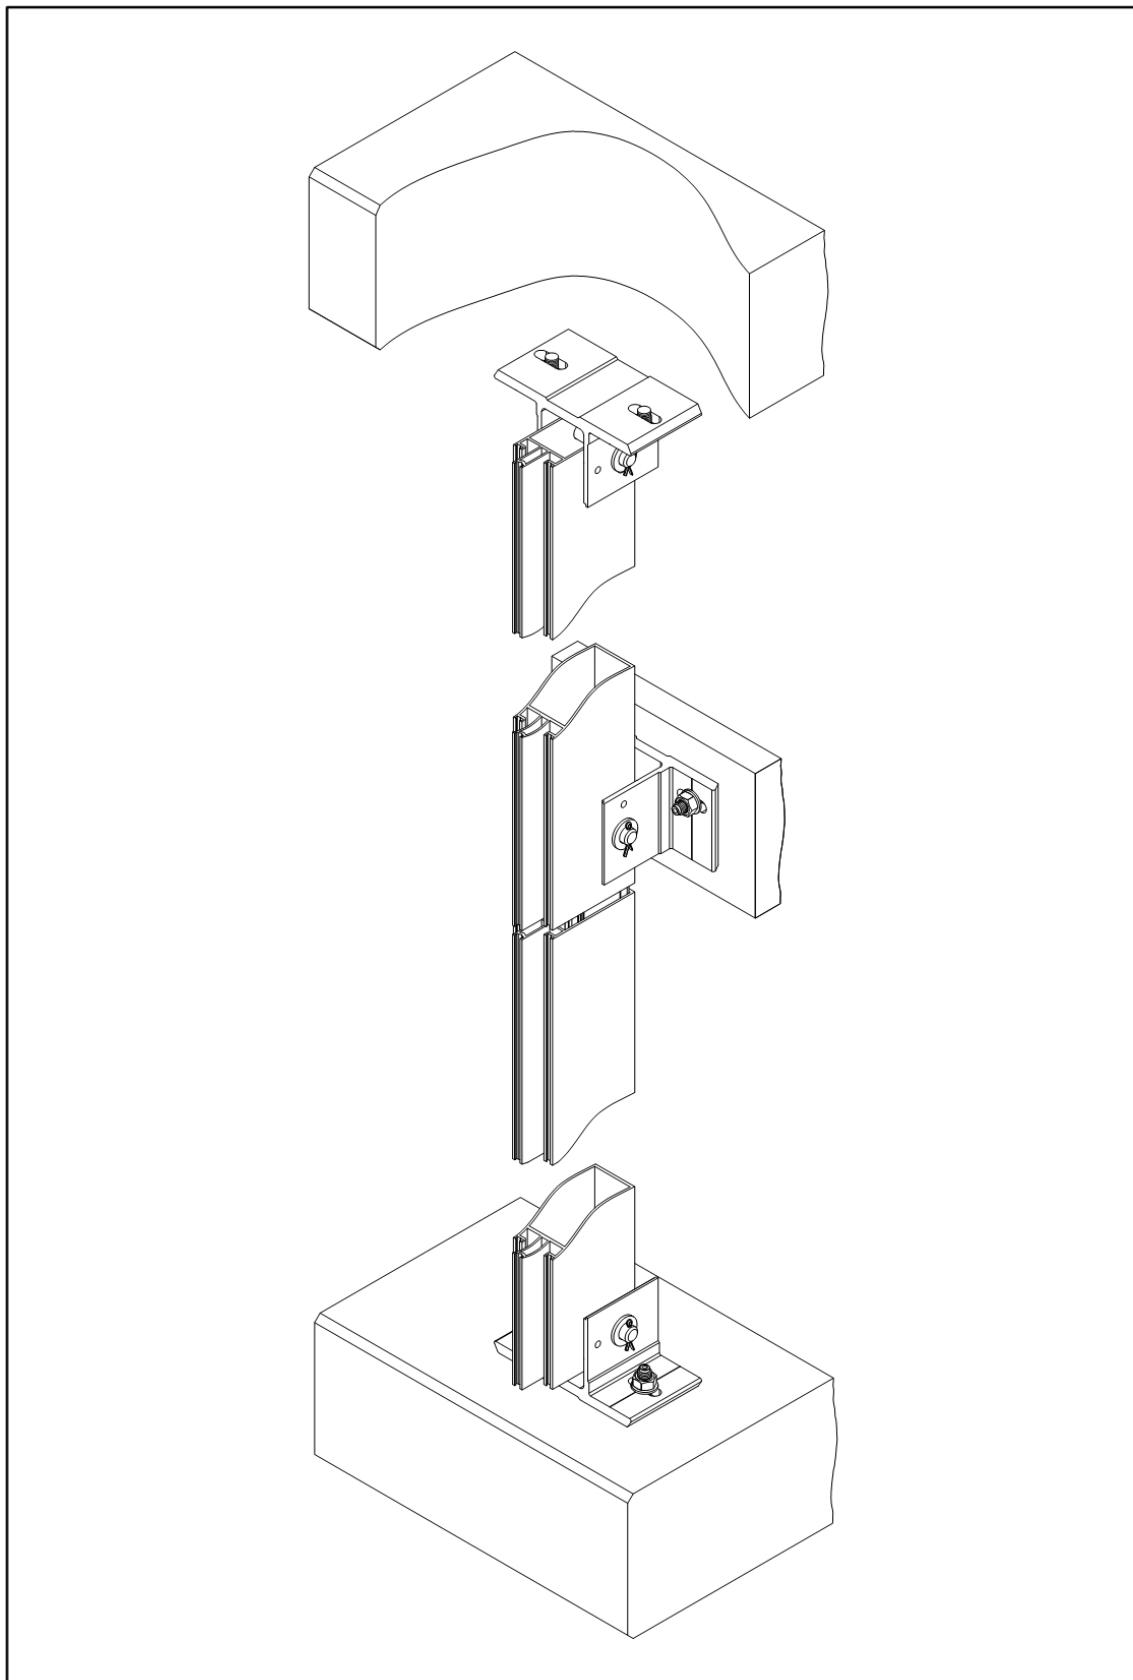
MB-SR50N EI EI60 system fixing brackets mounting diagram
